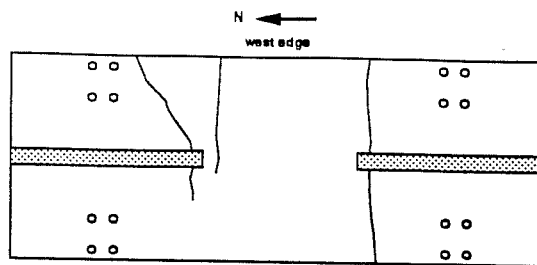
Sp. 2b: Progression of Cracking of Bottom Face of Second Floor Slab at Load Point 141
